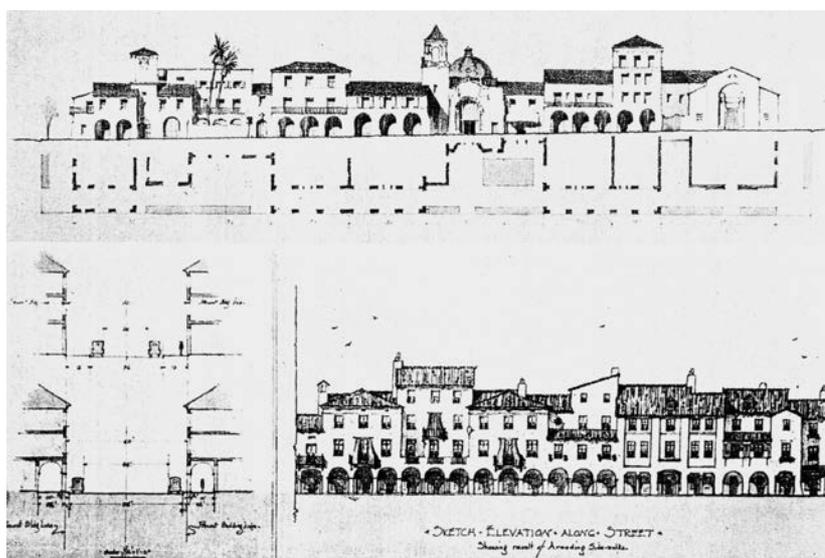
A Sketch of a block in State Street (above, below right) and a section plan of arcading State Street (below left)
